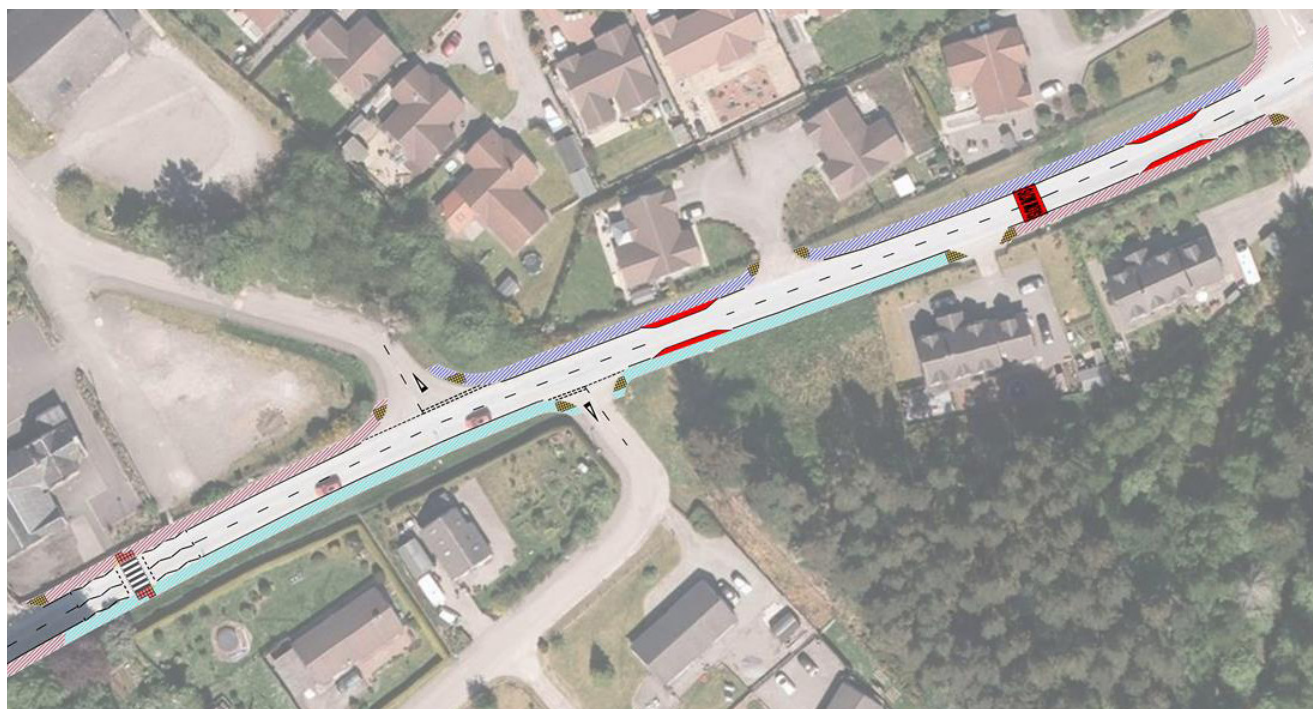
Plan view of section 2 of the project area showing a section of the design proposals including widened footpaths, extension of the footpath provision, visual narrowing, additional crossing point and changes in surface treatment
